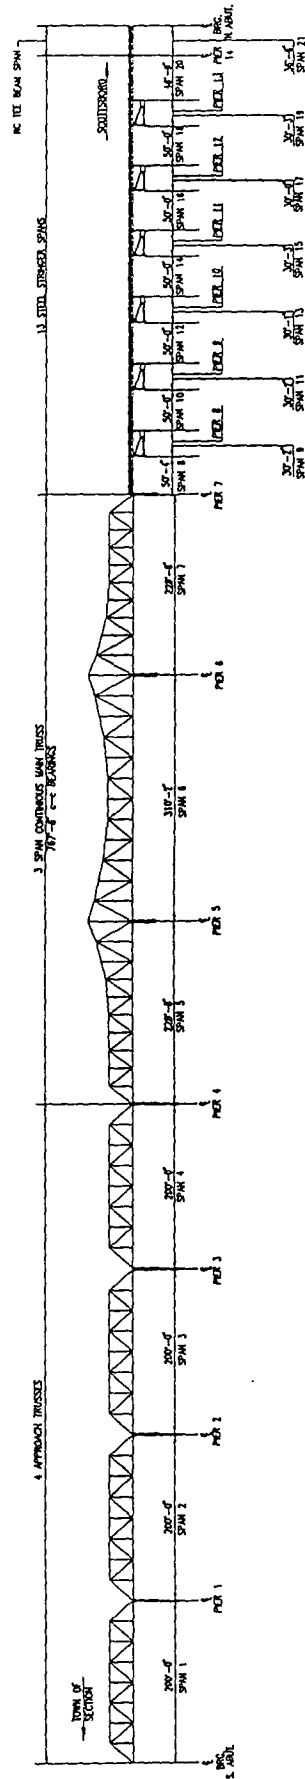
Elevation of Scottsboro Bridge (035-36-009.8A)
